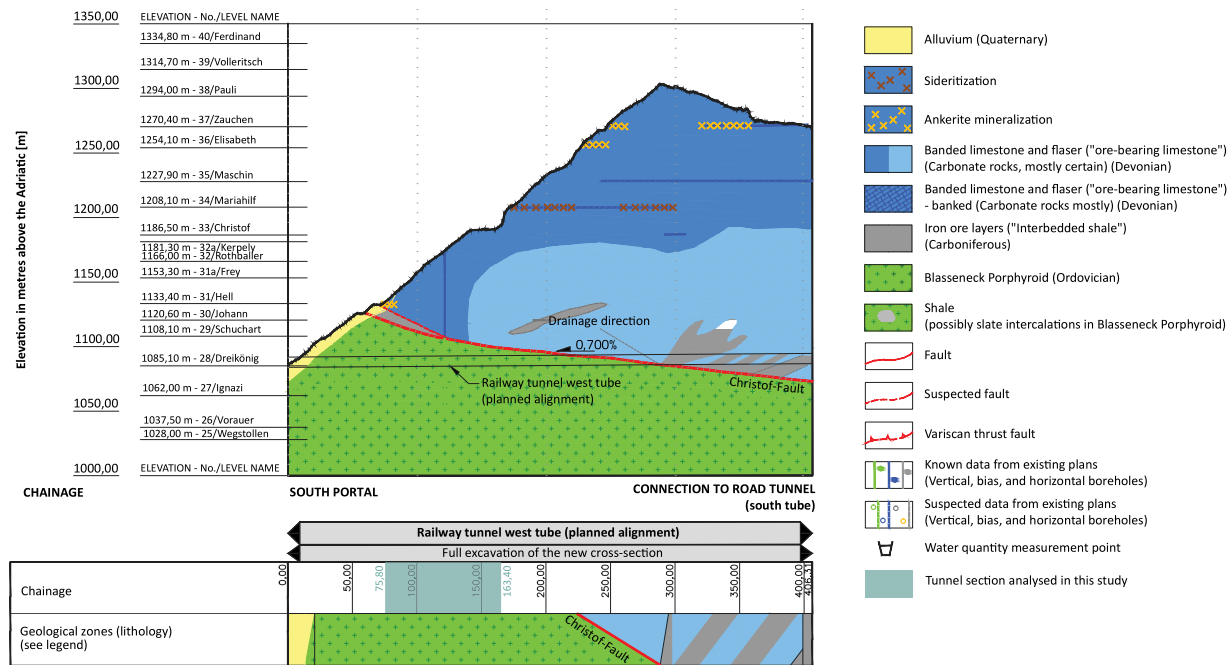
Geological longitudinal cross-section of the railway tunnel west tube.
